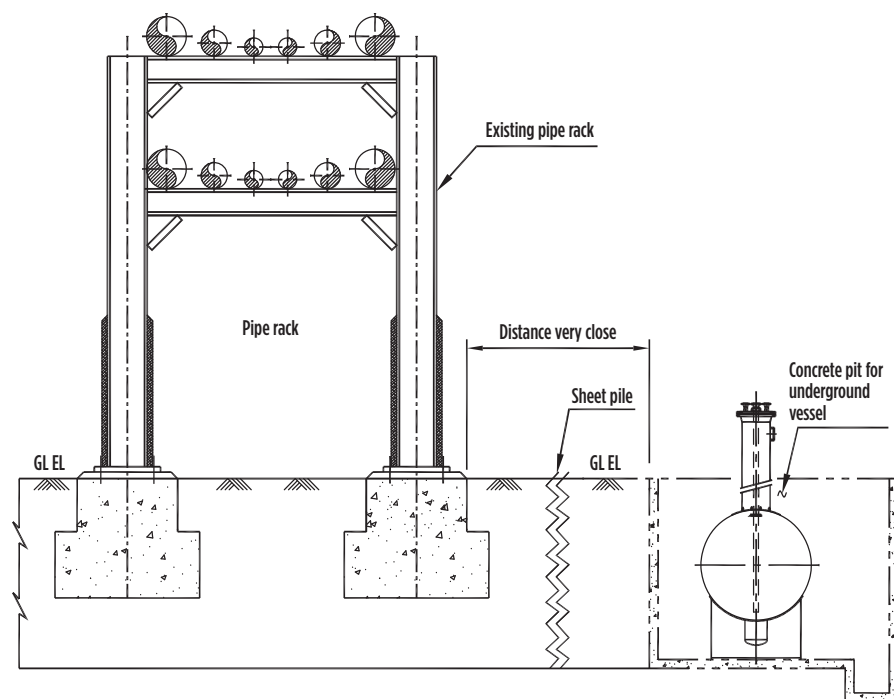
During excavation, sheet piling was used to protect the foundation of a pipe rack.
